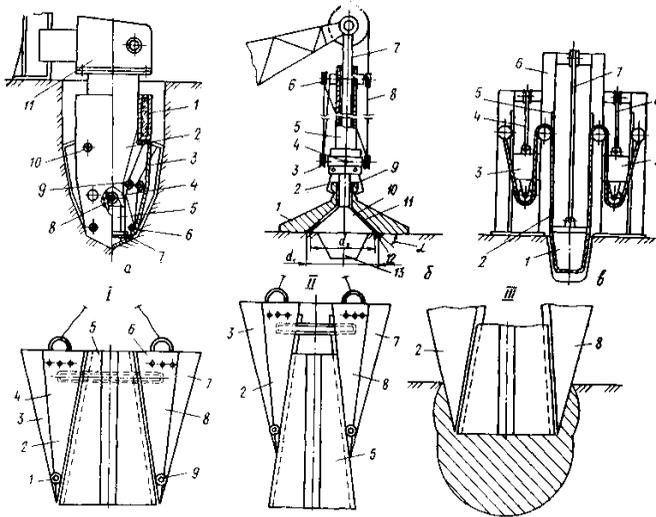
Devices for ramming recesses: *a* - with retractable sealing cheeks; *b* - with a sealing heel; *c* - with dynamic extraction of the working body; *r* - with movable percussion elements; I - starting position; II - pre-shock position; III - the formation of a compacted zone
